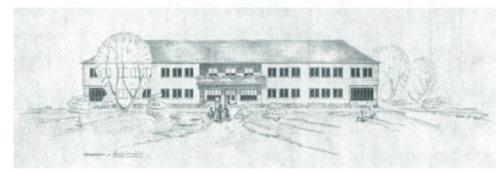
Karola Bloch's Weekly Childcare Facility – Plan & Elevation
